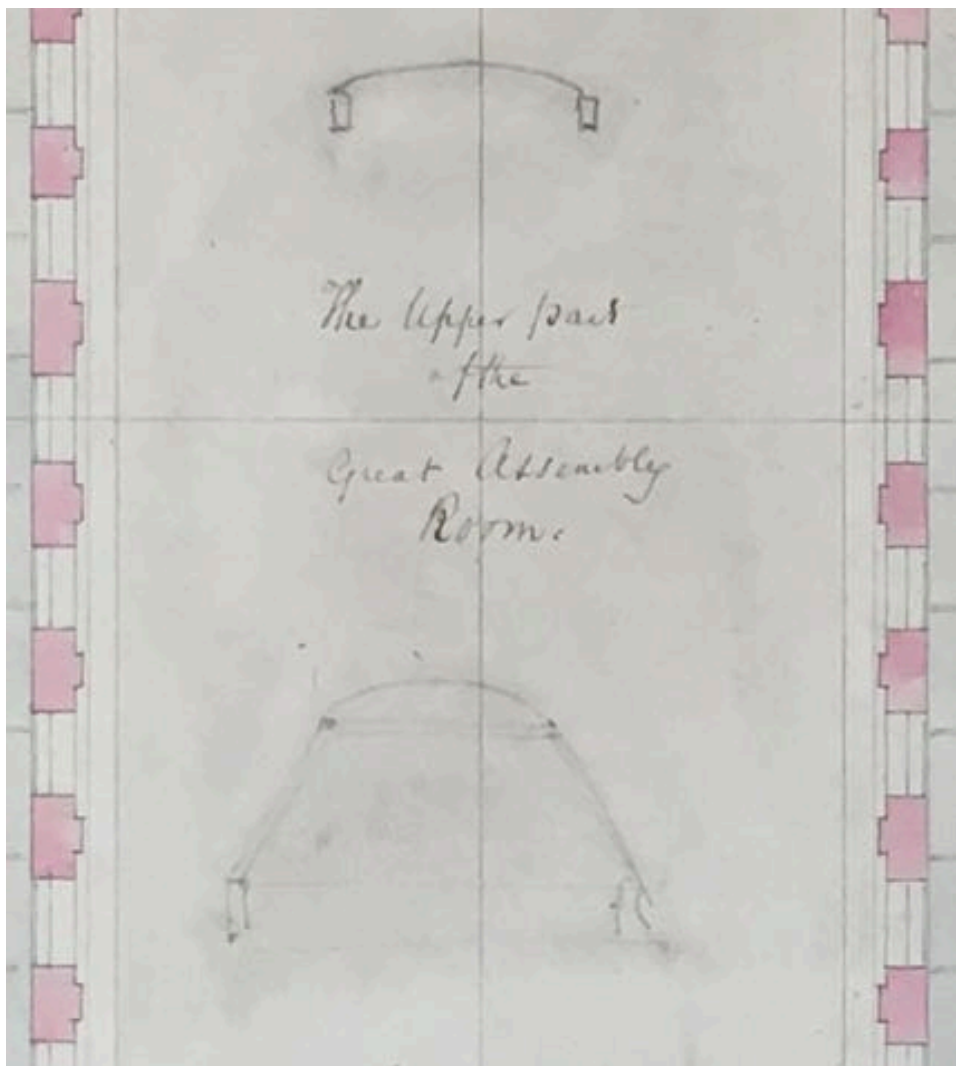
1843 Plan by J.B. & W. Atkinson – note the likely design sketch for the ventilation ducts. [© Borthwick Archives]
